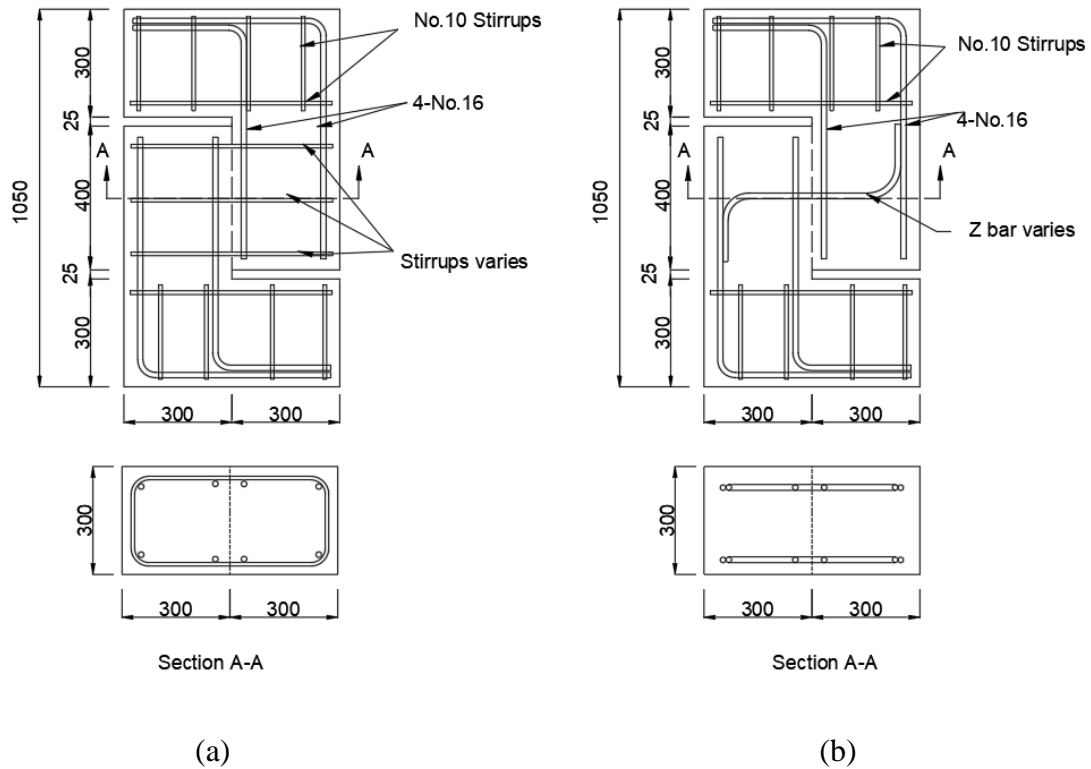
Specimen geometry and reinforcement configurations: (a) Specimens with closed stirrups connectors, and (b) Specimens with Z-shaped connectors
